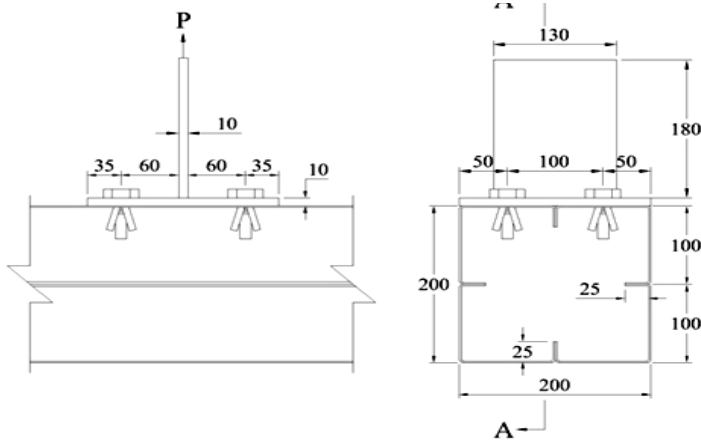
The Arrangement of Hollo-Bolt and T-Stub End Plate (All Dimensions are in mm) (source by author)
